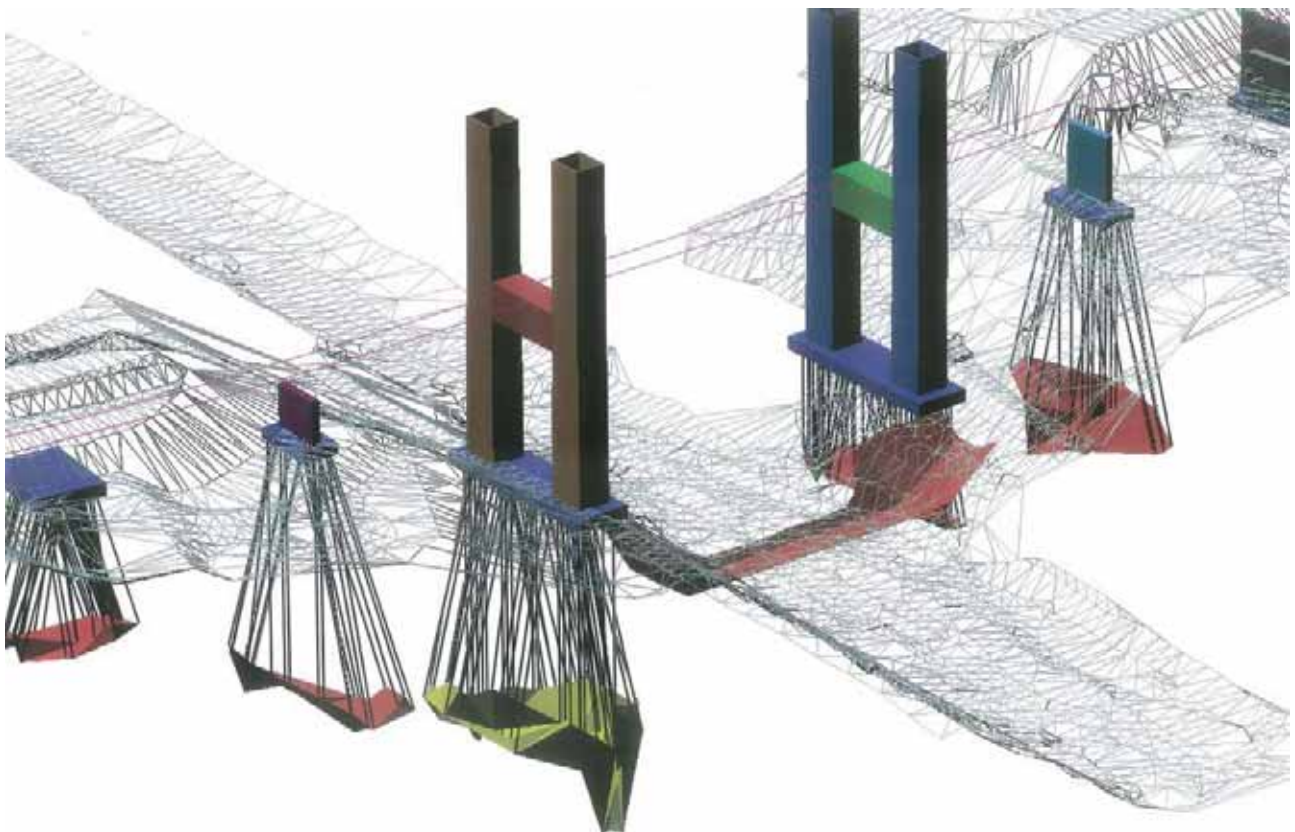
3D Illustration of pile foundations and concrete structures for the abutment, intermediate piers and pylon structures
